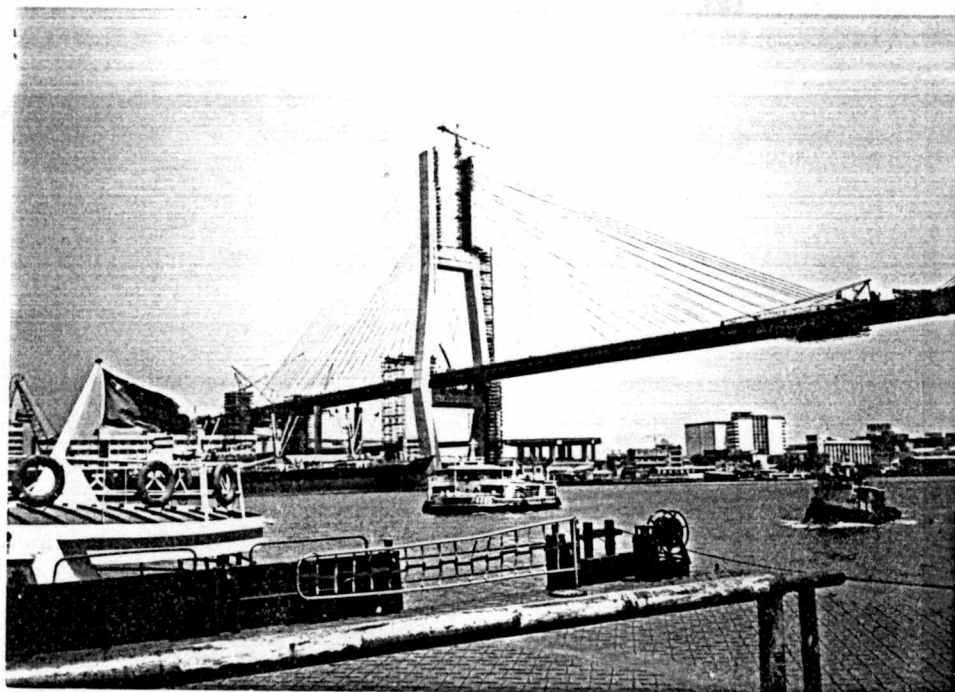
The Construction Sites of Nan Pu Bridge and Yang Gao Road.
